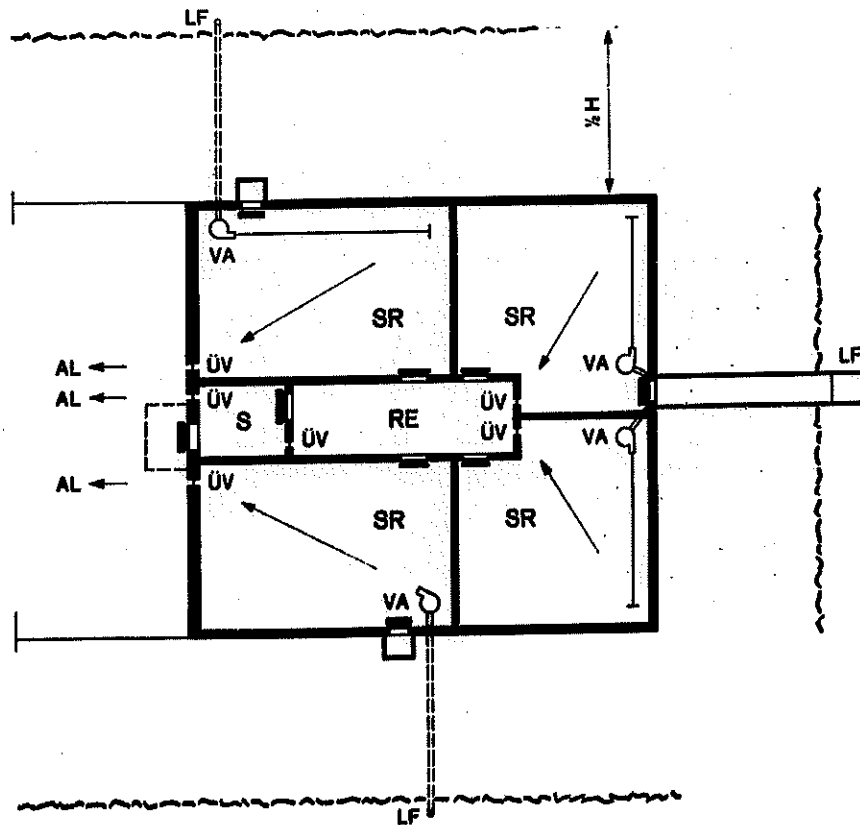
The arrangement of the ventilating equipment in a four-celled shelter group (151 to 200 places).
